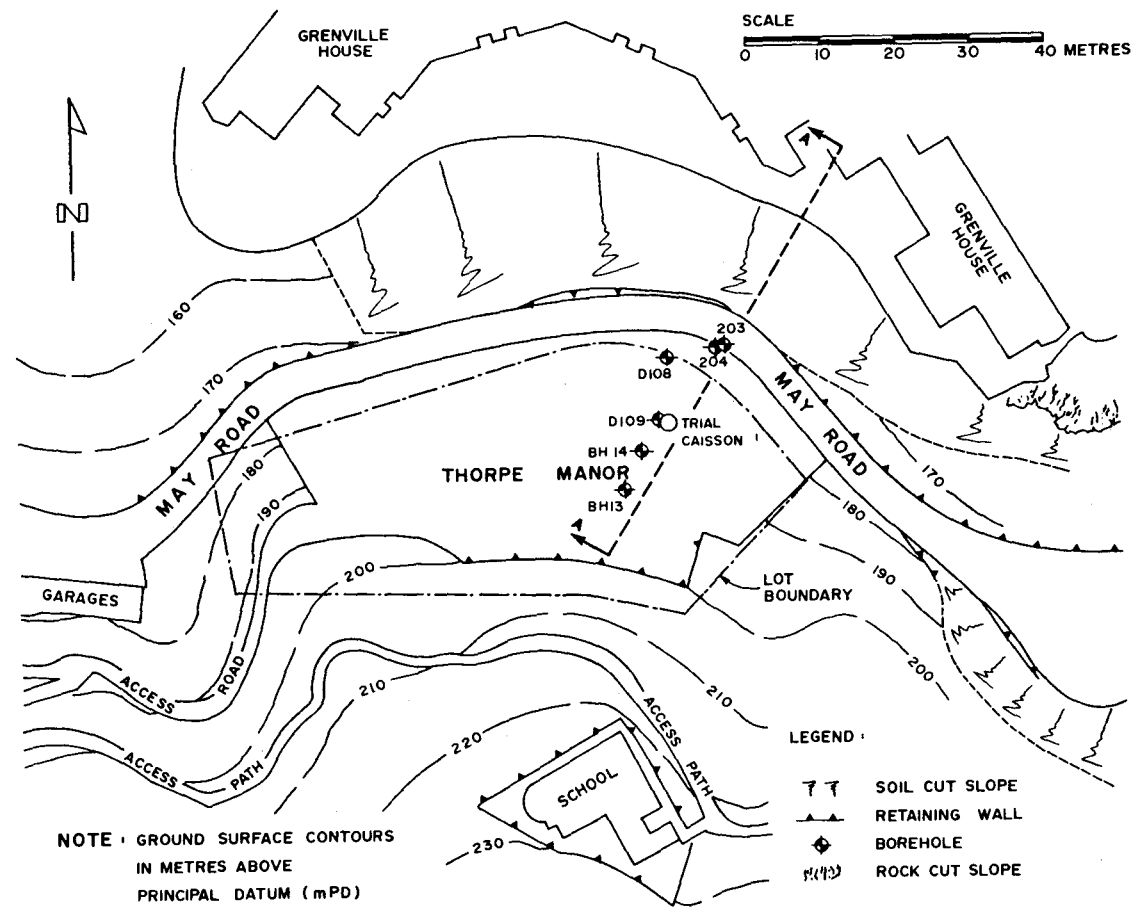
Site plan for Thorpe Manor, Hong Kong
